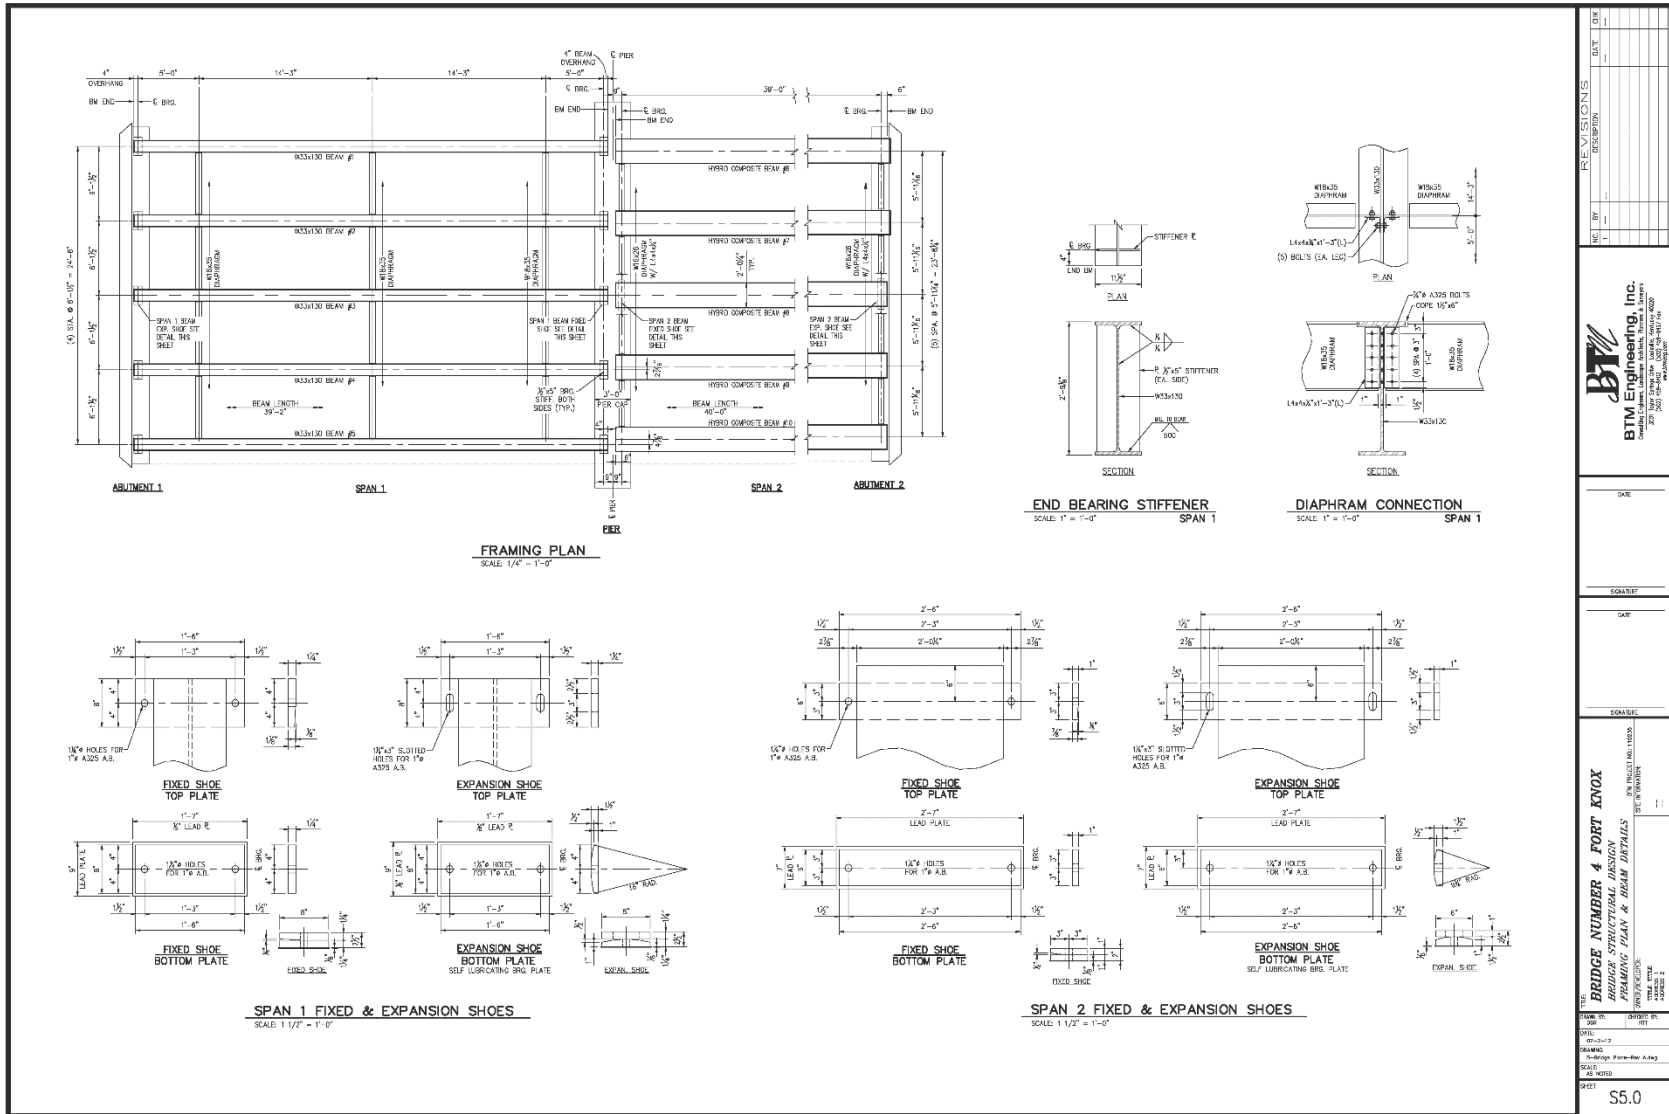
Engineer drawing for bridge pier on Bridge No. 4, Fort Knox.
